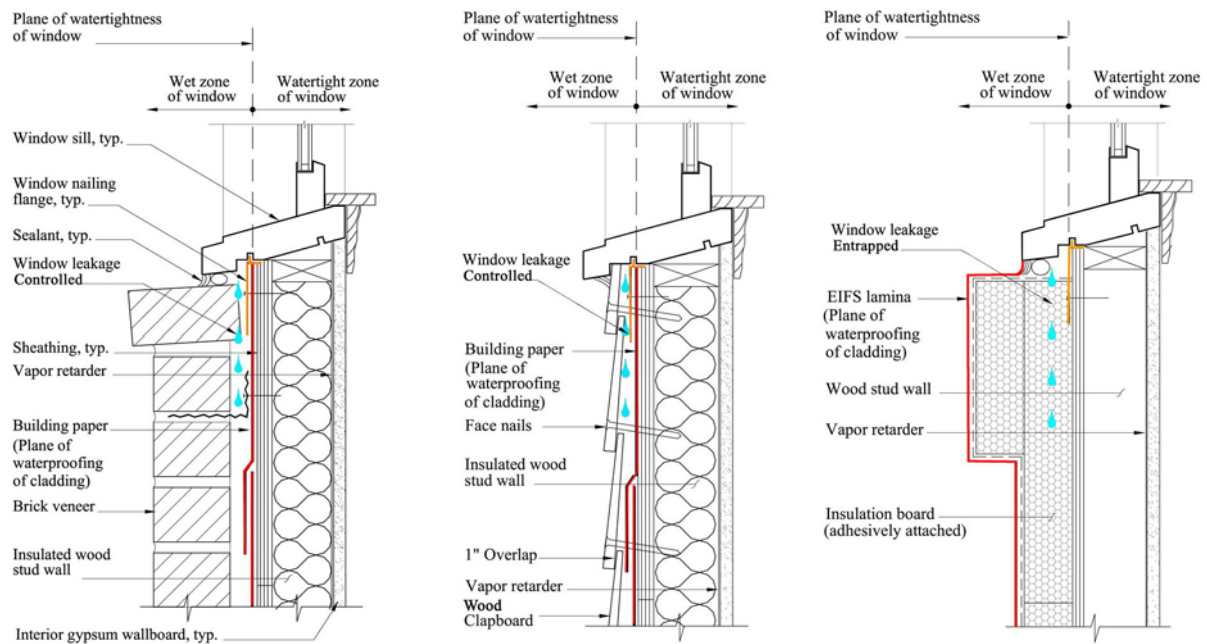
Vertical sections through walls. Typical wood-framed wall shown with brick cladding (left), wood cladding (center), and barrier-EIFS cladding (right). Note the location of the plane of watertightness of windows assumed by certain test standards (shown in orange) with respect to the plane of waterproofing for cladding (shown in red). In brick- and wood-clad walls, the location of cladding waterproofing accommodates and controls typical window and sealant joint leakage (shown in blue) in the “wet zone,” protecting the wood structure from water and decay. In EIFS cladding, the outer location of wall waterproofing with respect to windows and sealant results in a wall system that cannot accommodate typical window and sealant joint leakage in the “wet zone.” When window or sealant-joint leakage inevitably occurs, moisture is trapped behind the EIFS cladding, promoting rapid deterioration of the wood-framed wall and sheathing.
